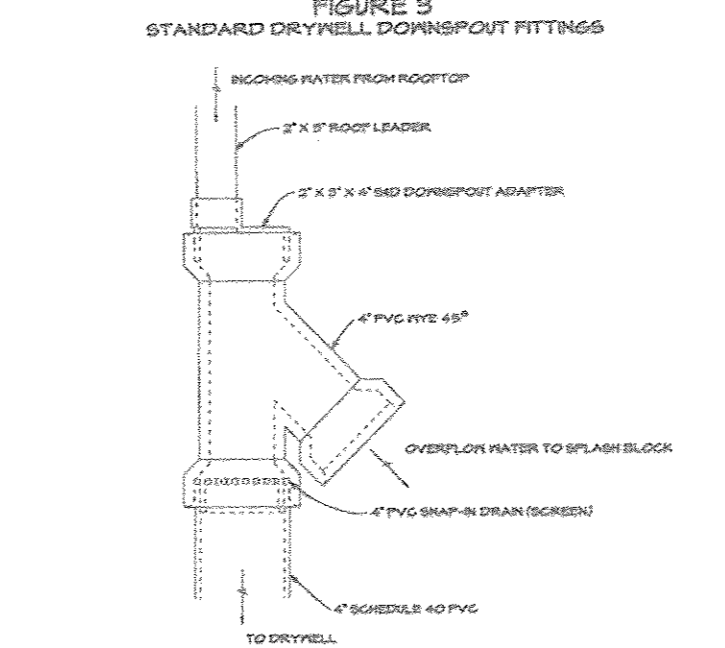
STANDARD DRYWELL DOWNSPOUT FITTINGS
